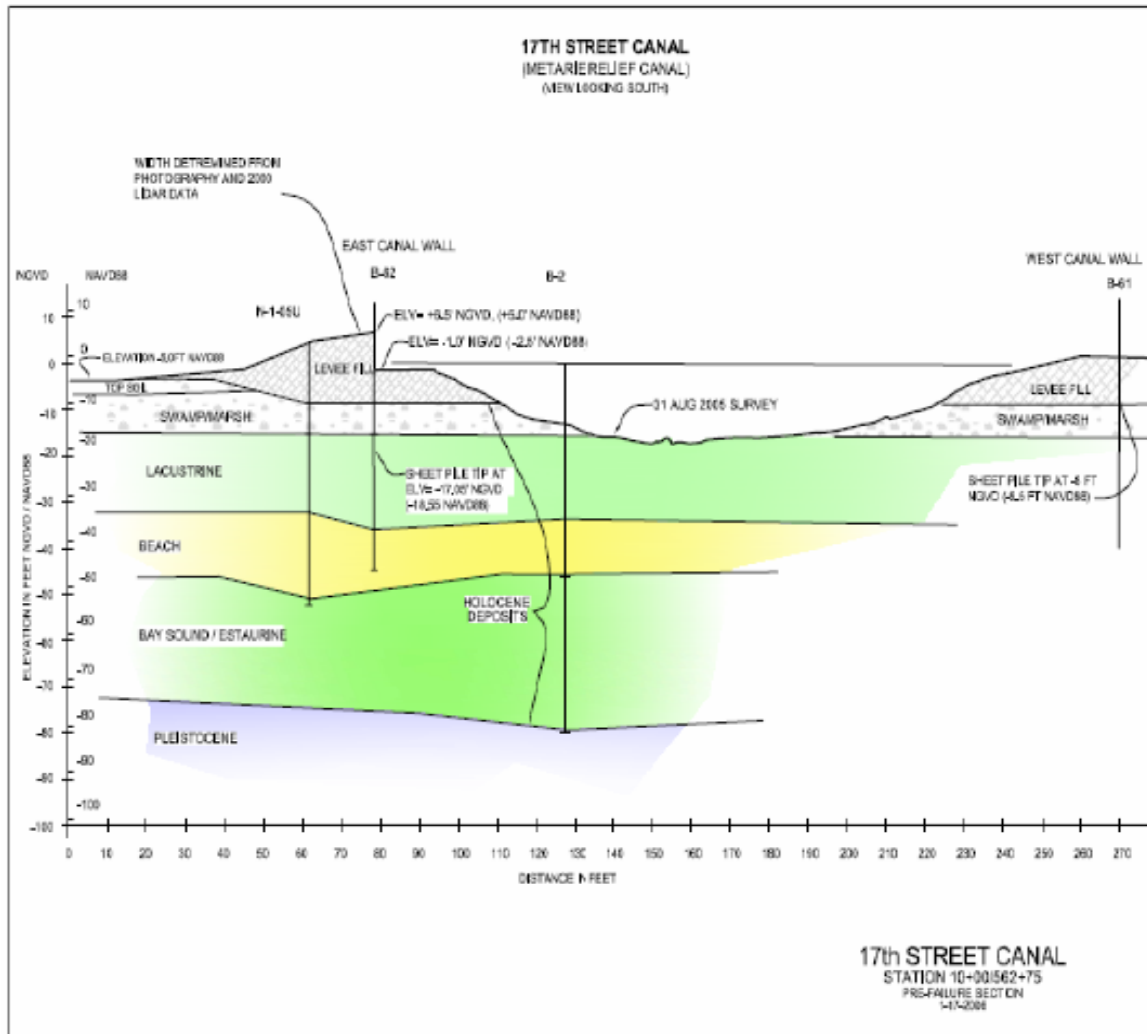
Diagram of breach cross section on 17<sup>th</sup> Street Outfall Canal before failure (IPET 2007)
